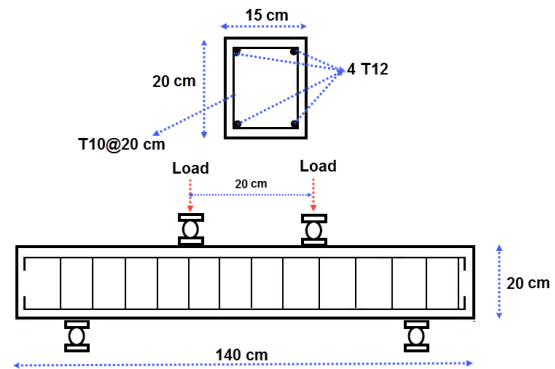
Geometric specifications and steel reinforcement details of the investigated beams
